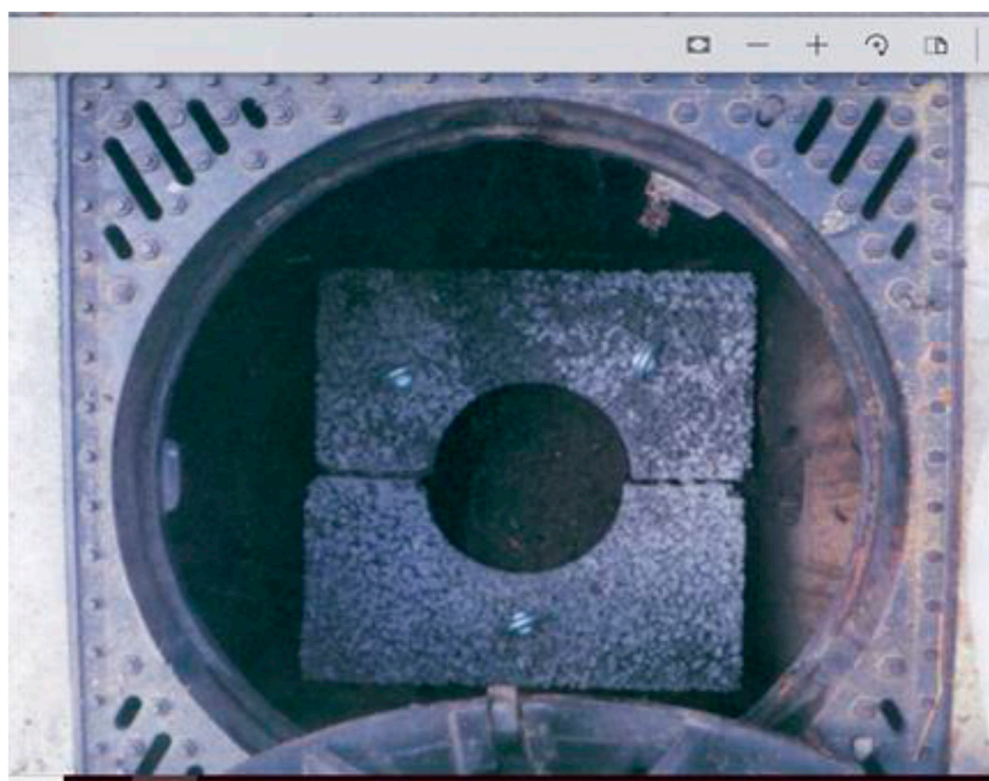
Porous concrete plate at the bottom of the street stormwater inlet.
